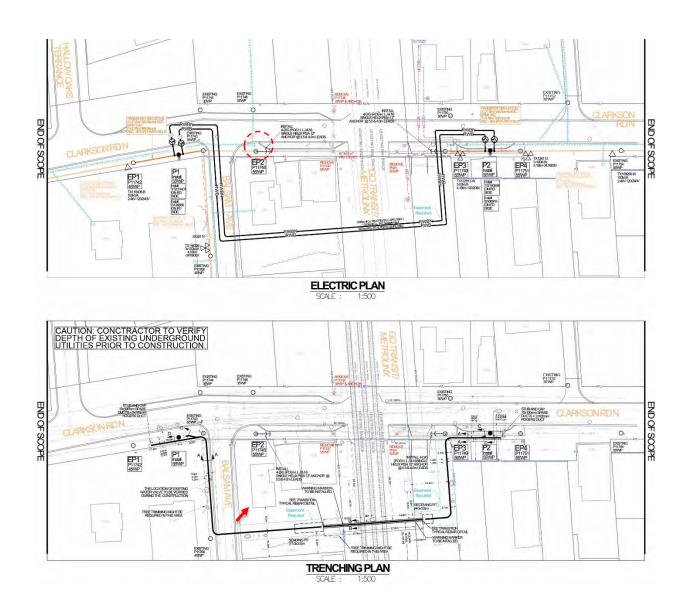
Electric Plan and the Trenching Plan of the proposed development showing the Heritage Resource fronting onto Clarkson Road North, annotated by *AREA* (Source: Metrolinx GO Elec. LWL – CONFLICT #LW26 Clarkson Road North-Lakeshore Road West to Truscott Drive, Electrical and Trenching, Sheet No. D07-396295-002)
